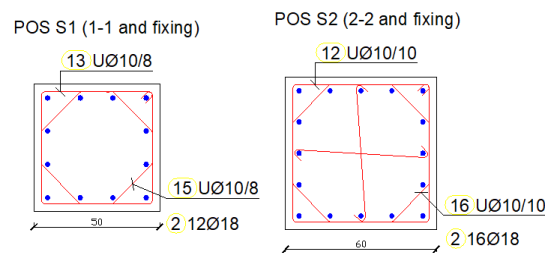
Adopted reinforcement in columns S_1 and S_2 for the building on the ground type B and C
